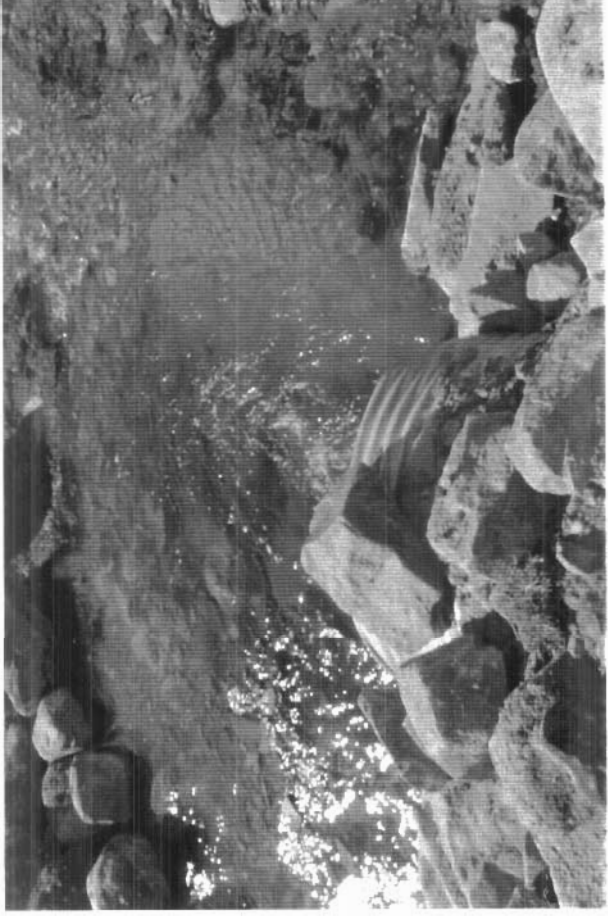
Km 18 Culvert, 30 June 2002. Resting pool on downstream end of culvert during high flow.
